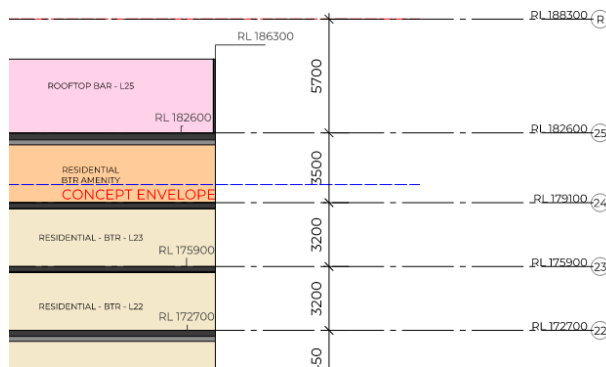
Current proposed long section highlighting removal of Level 25 for Tower 1 (Source: Woods Bagot)
